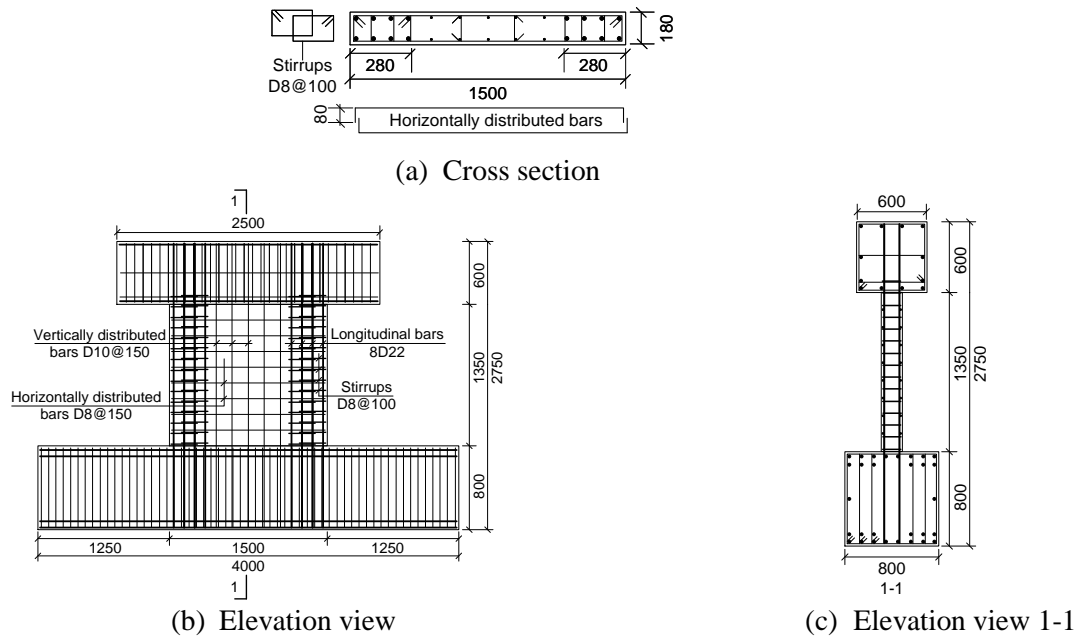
Geometry and reinforcement of specimens (units: mm)
